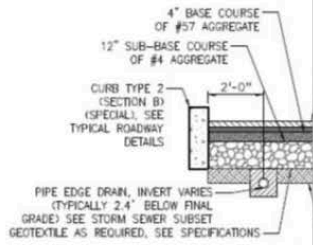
Pearl Pkwy Permeable Pavement Cross-Section
